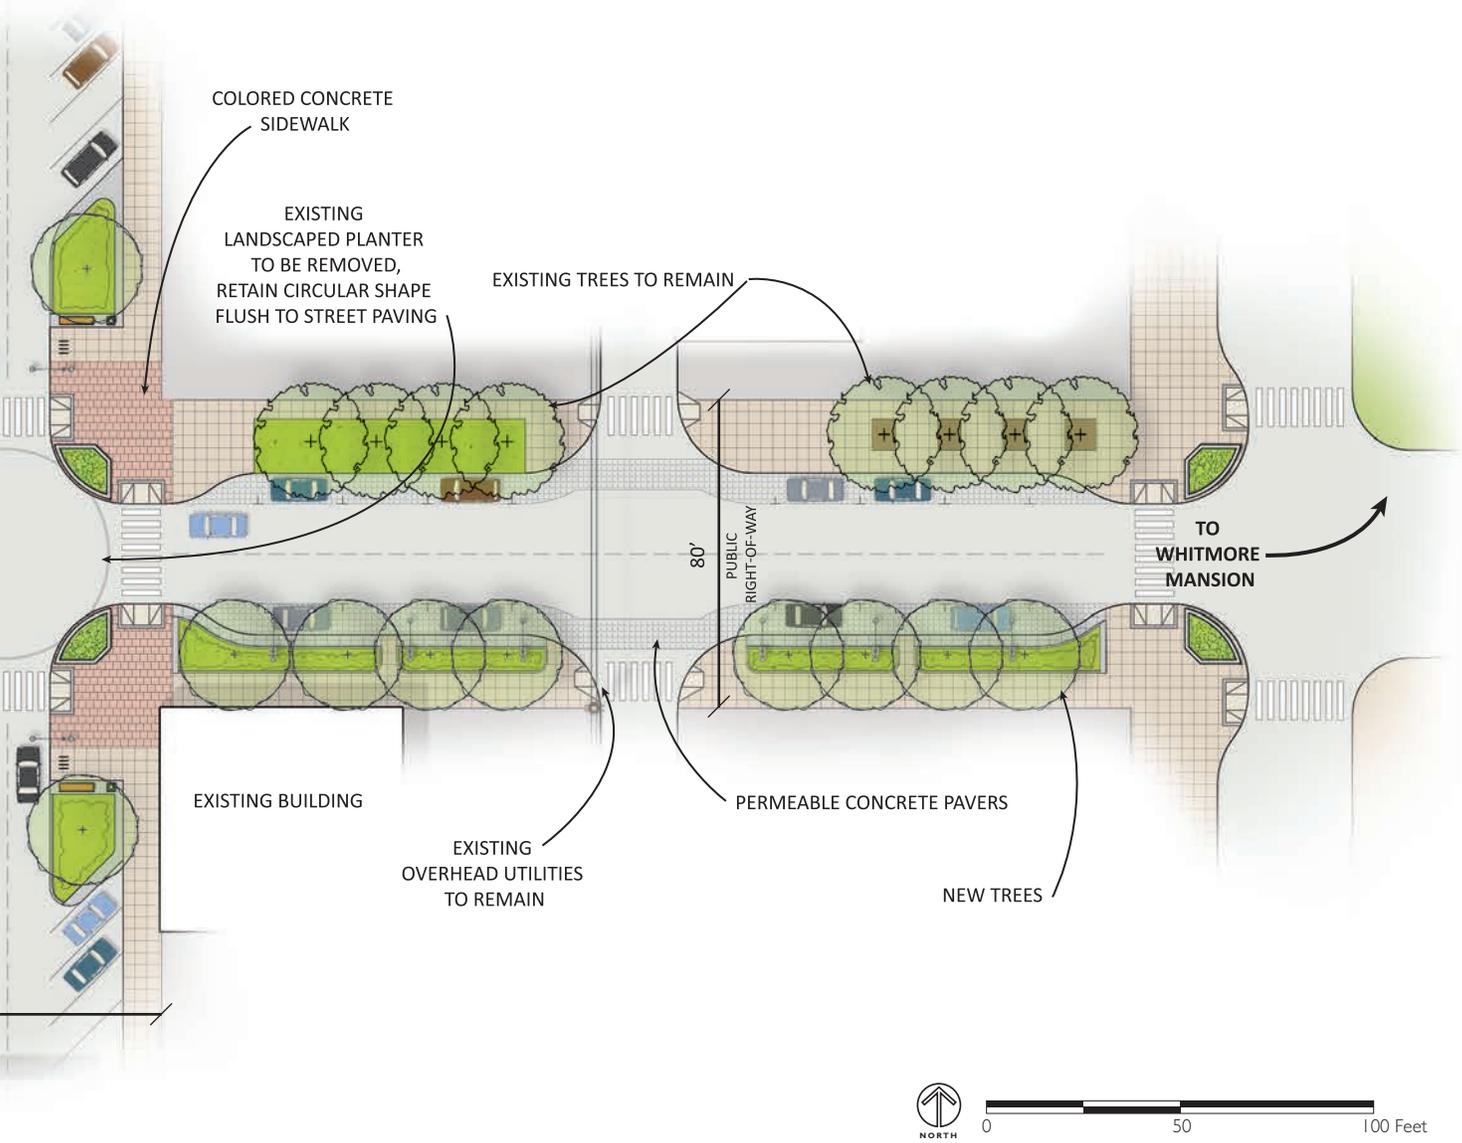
shows a conceptual streetscape plan for North Street, which connects Whitmore Park and the proposed green space at the Whitmore Mansion. The figure illustrates how the North Street Green Connection concept could be implemented in the existing street right-of-way, including a redesign of the Fourth Street/North Street intersection. Some of the existing street trees are proposed to be retained on North Street, however new street trees are also proposed. Bioswales are planted with trees and can also accommodate street lighting. Parallel parking areas are designed with permeable concrete pavers that also assist in stormwater management by allowing runoff to be absorbed back into the ground. All overhead utility wires currently running parallel with North Street are proposed to be removed to improve the aesthetic character of this important Downtown street. It is recommended that overhead utilities located in alleys are preserved since they only cross North Street at alley locations.
